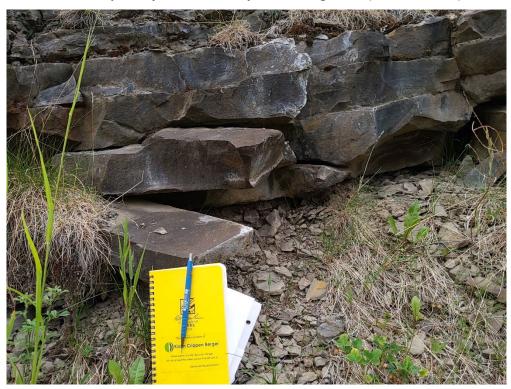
Spillway Outlet – Looking upstream (BTD-2021-04)
